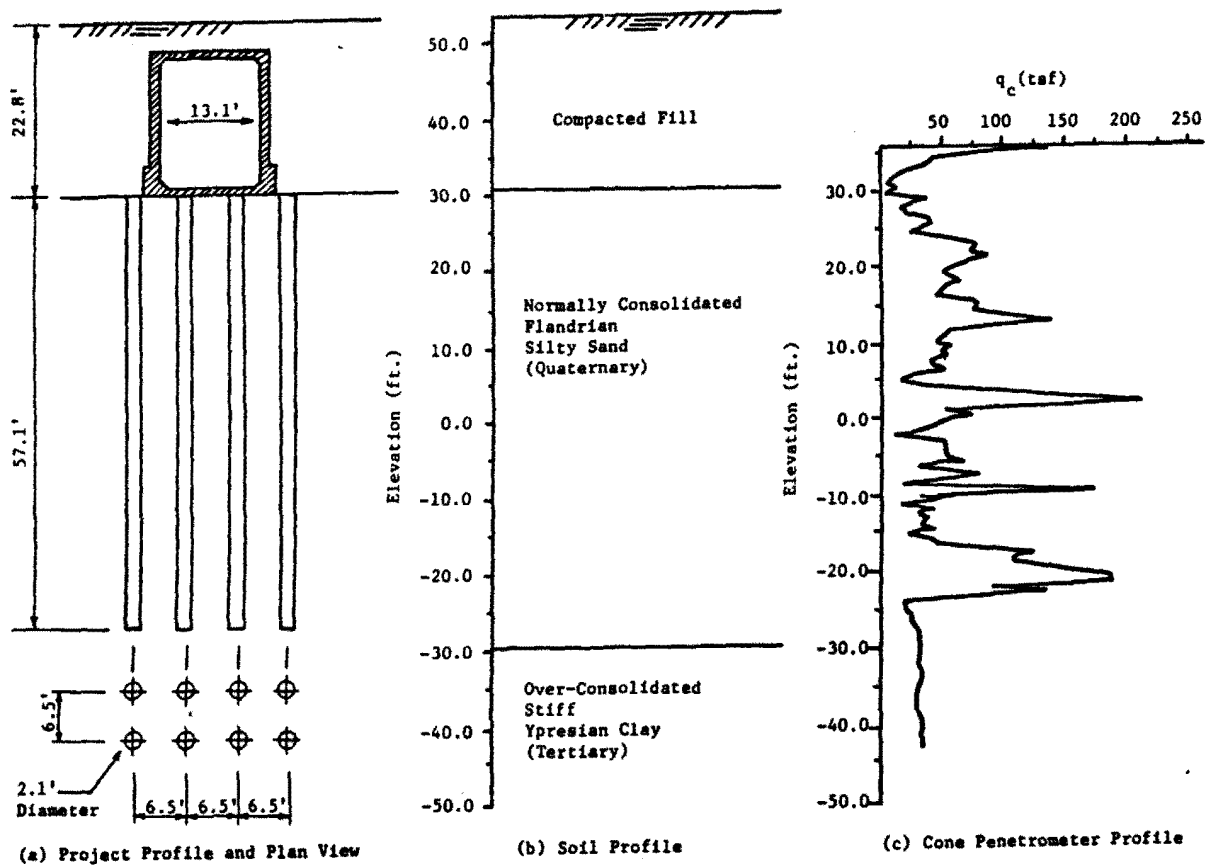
USE OF RAMMED STONE COLUMNS FOR TUNNEL SUPPORT AT DEINZE, BELGIUM.
